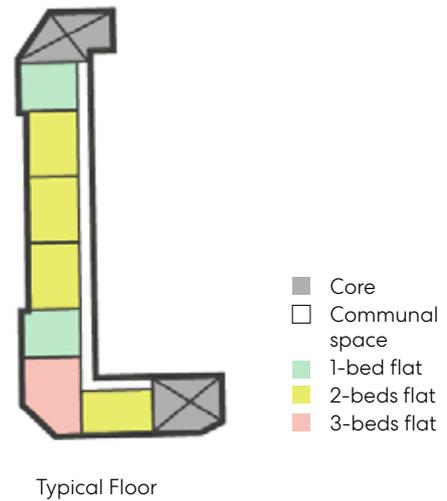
Aldi Car Park Long Term Illustrative Plan
